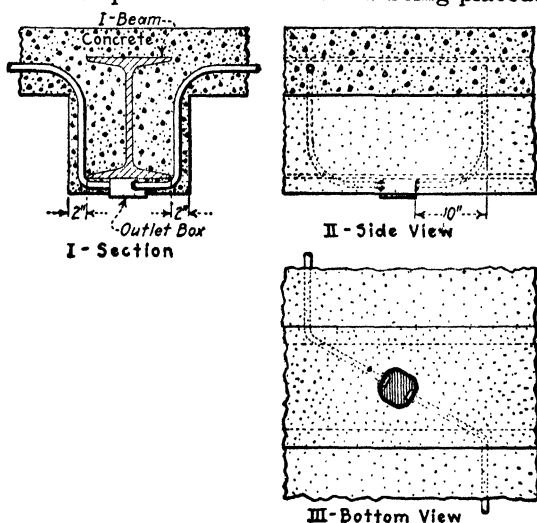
Outlet box installed in restricted space, conduit bends of standard radius being used.
